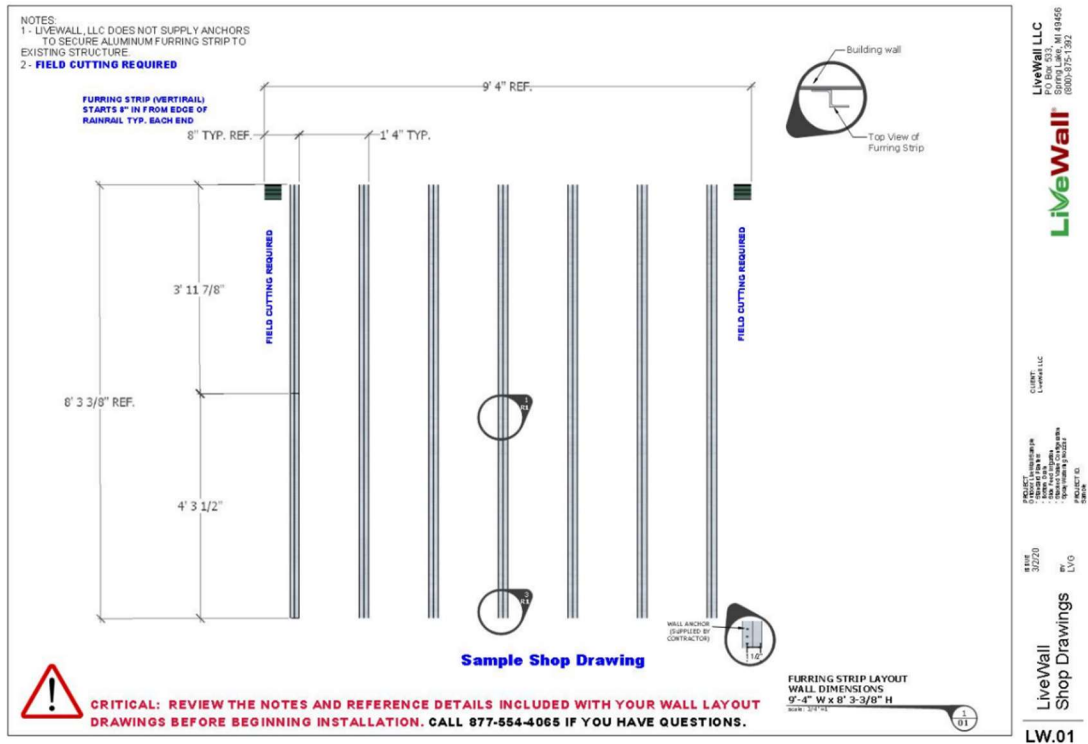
LiveWall Shop Drawing: Furring Strips
